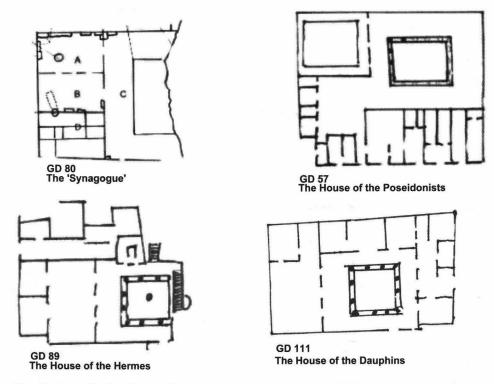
Four Similar House Plans (after Ducat and Bruneau 1966)
